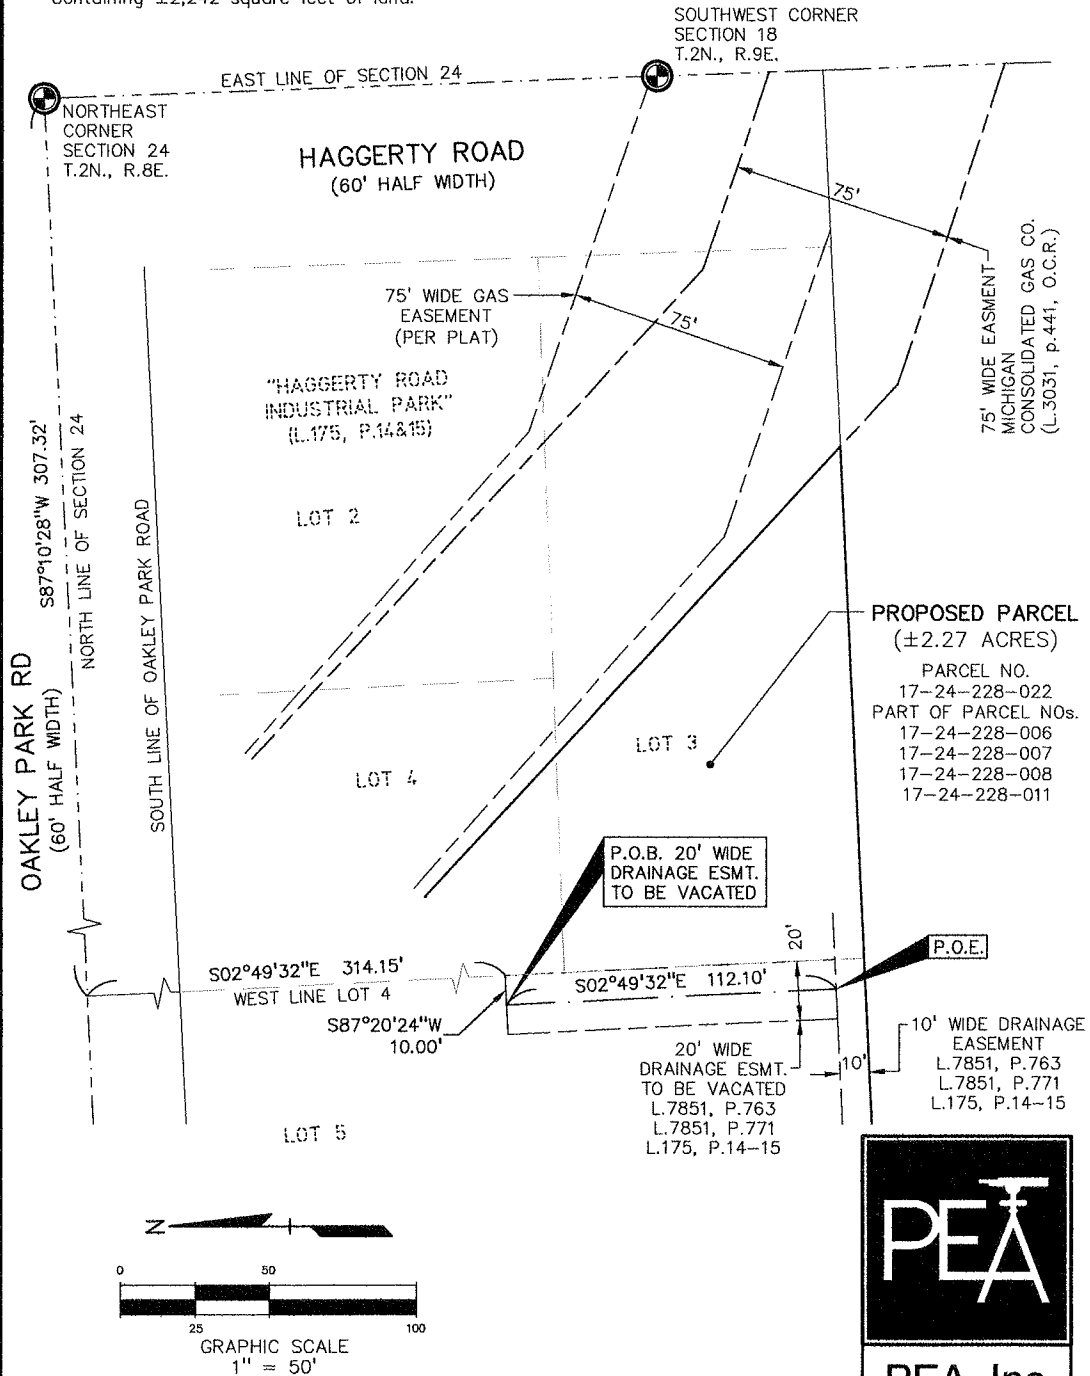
EXHIBIT B LEGAL DESCRIPTION AND SKETCH OF PROPOSED EASEMENT VACATION
